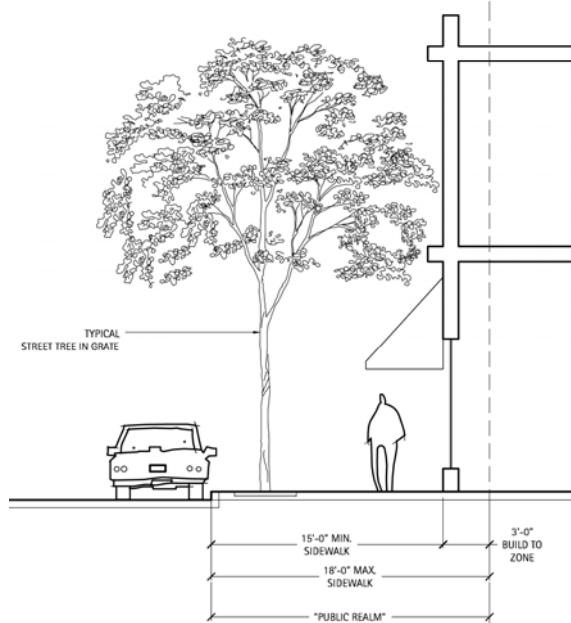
Section of Typical Downtown Streetscape Frontage
